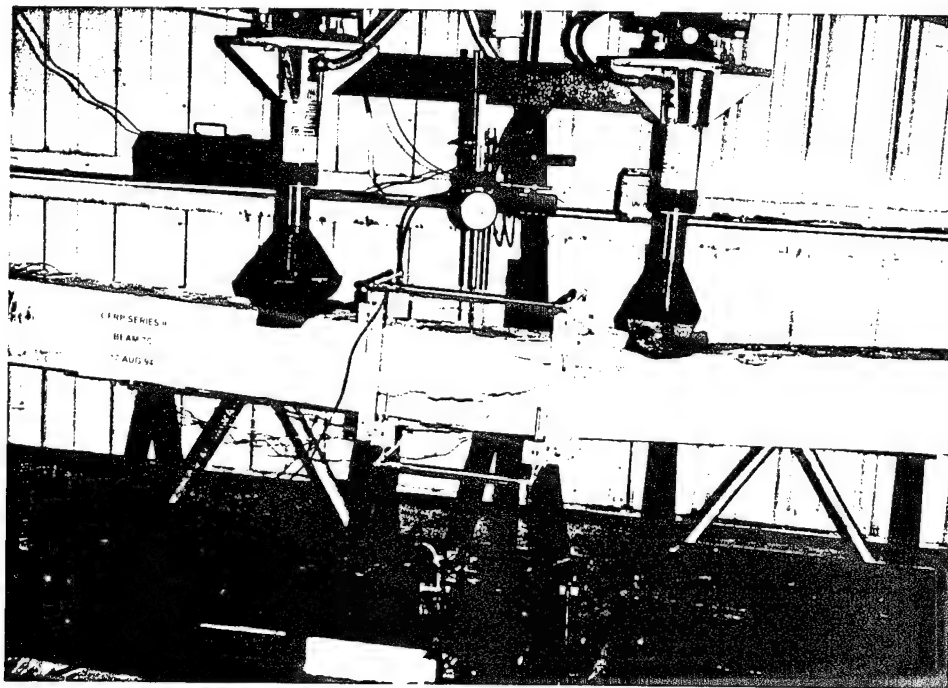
Photograph of beam failure by concrete compression of a Series 7 beam.
